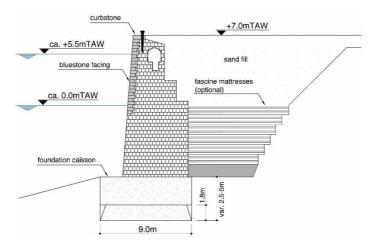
Standard section of the masonry quay walls on top of the foundation caissons, filled with concrete
